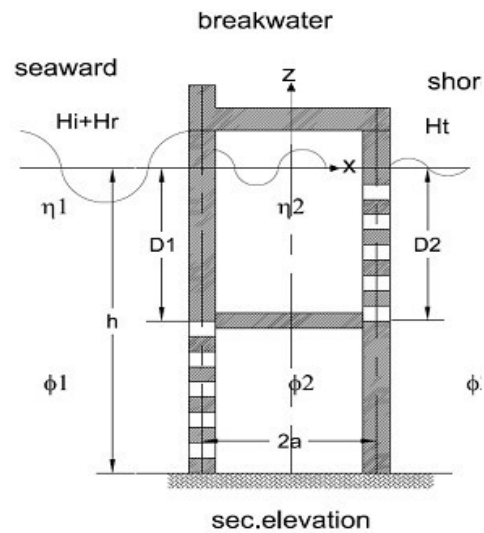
Breakwater with vertical porous wall but no horizontal opening
